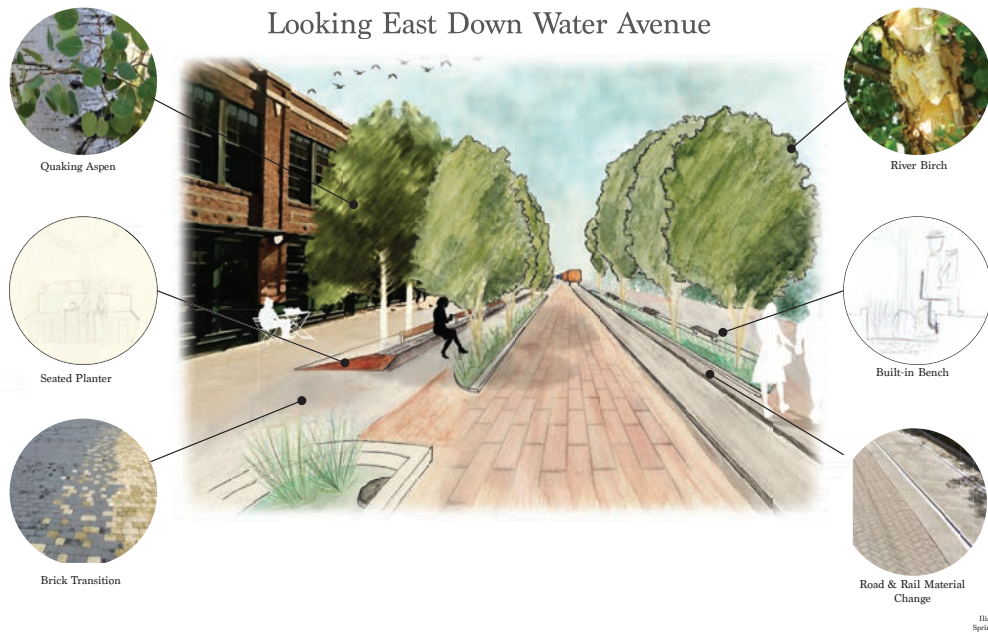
Perspective looking east down Water Avenue toward Monteith Park details the seated planters, storm water facilities, and material changes from walkway to road and back again.
